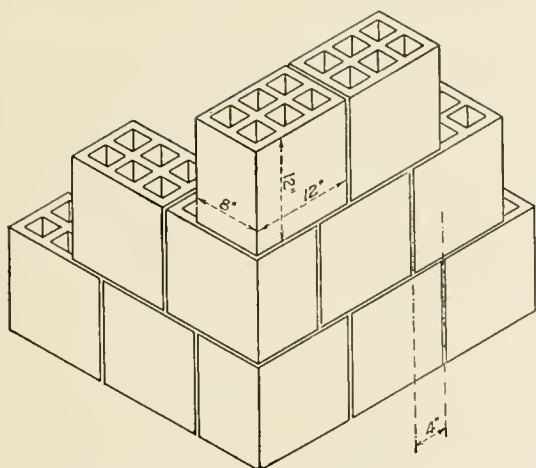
The usual corner bond for end construction tile in 8" wall when surfaced with stucco.
